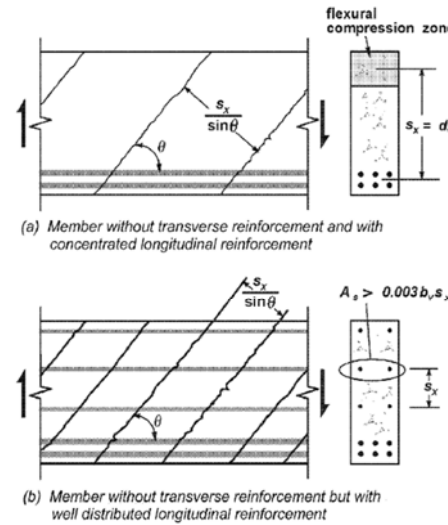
Definition of Crack Spacing Parameter s_x .
